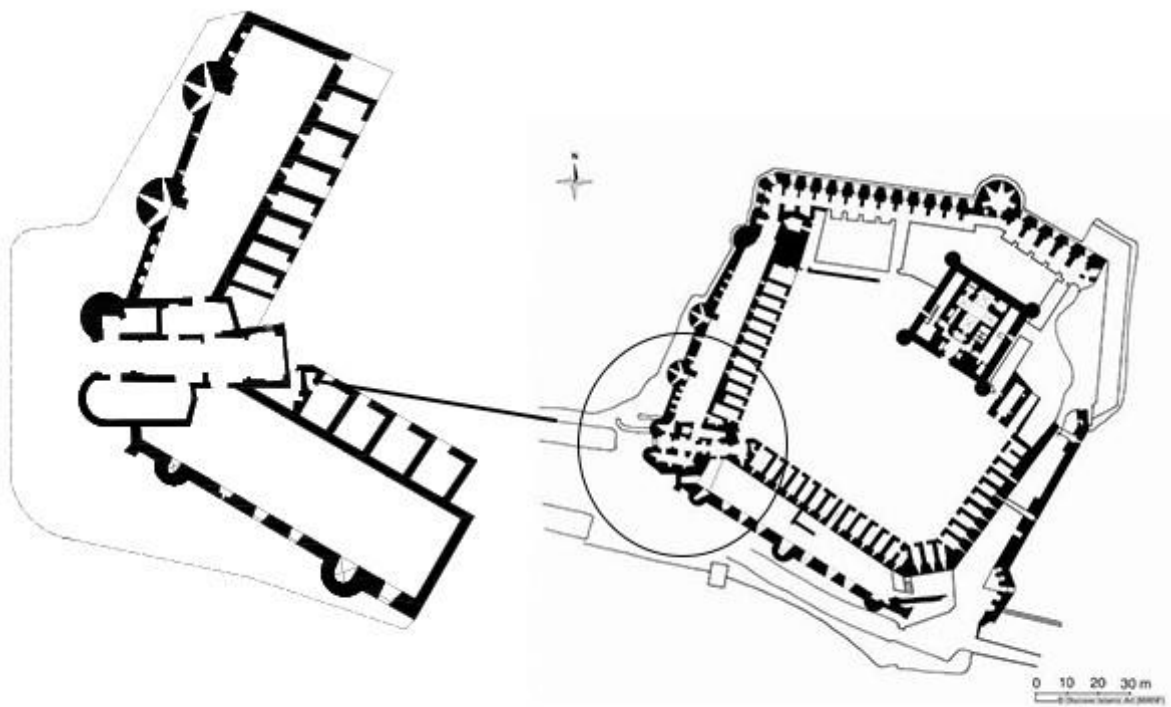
The floor plan of aquarium museum in Qaitbay castle in alexandria
